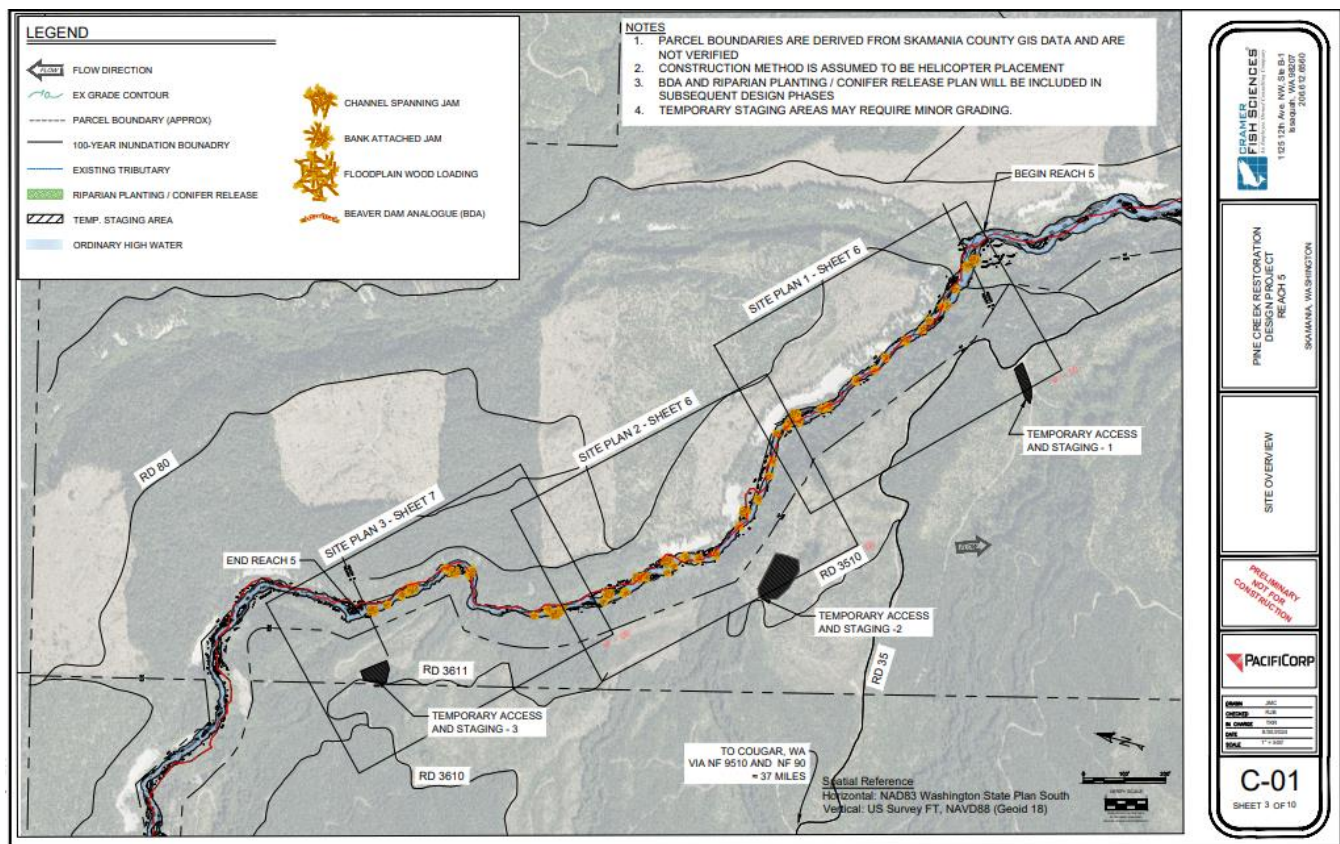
BOD report site overview sheet for plan sets for Reach 5 of Pine Creek.
